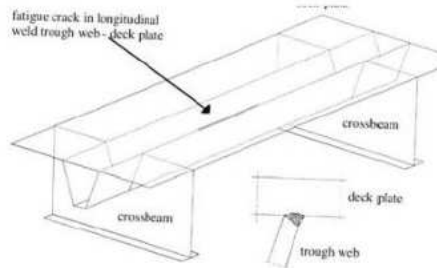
Cracks in the longitudinal weld trough-deck plate
